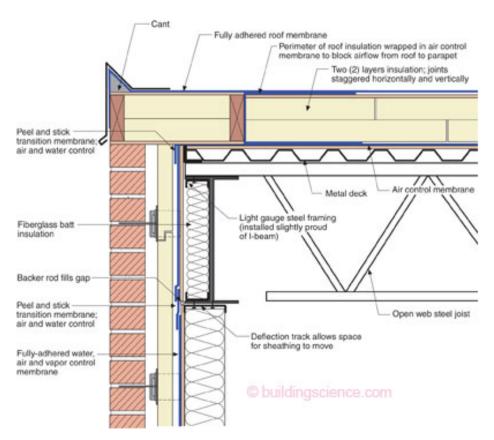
The Cantilevered Mini Parapet—Notice that air control layer continuity is achieved by wrapping the membrane over the building corner and then constructing the cantilevered portion of the parapet over the top of this air seal.
